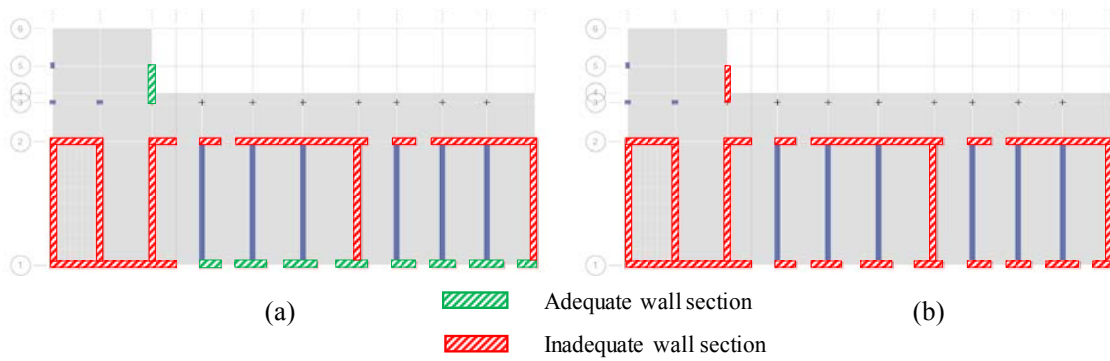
Wall condition in typical floor plan (a) BNBC 1993 EQ loading condition (b) BNBC 2017 EQ loading condition
